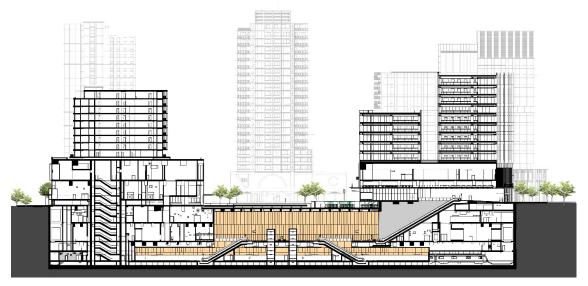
A longitudinal cross section of the new Waterloo metro station
